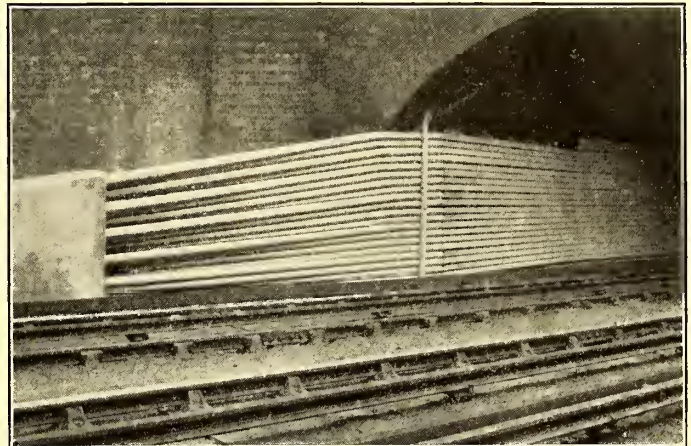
CABLE TROUGHING CONSTRUCTION UNDER HIGH STREET BRIDGE, WEST END
